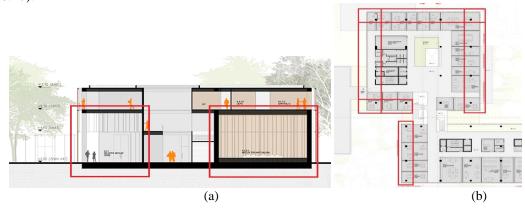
(a): Chamber of assembly-town hall entrance section, (b) Cantilevers on the second storey
